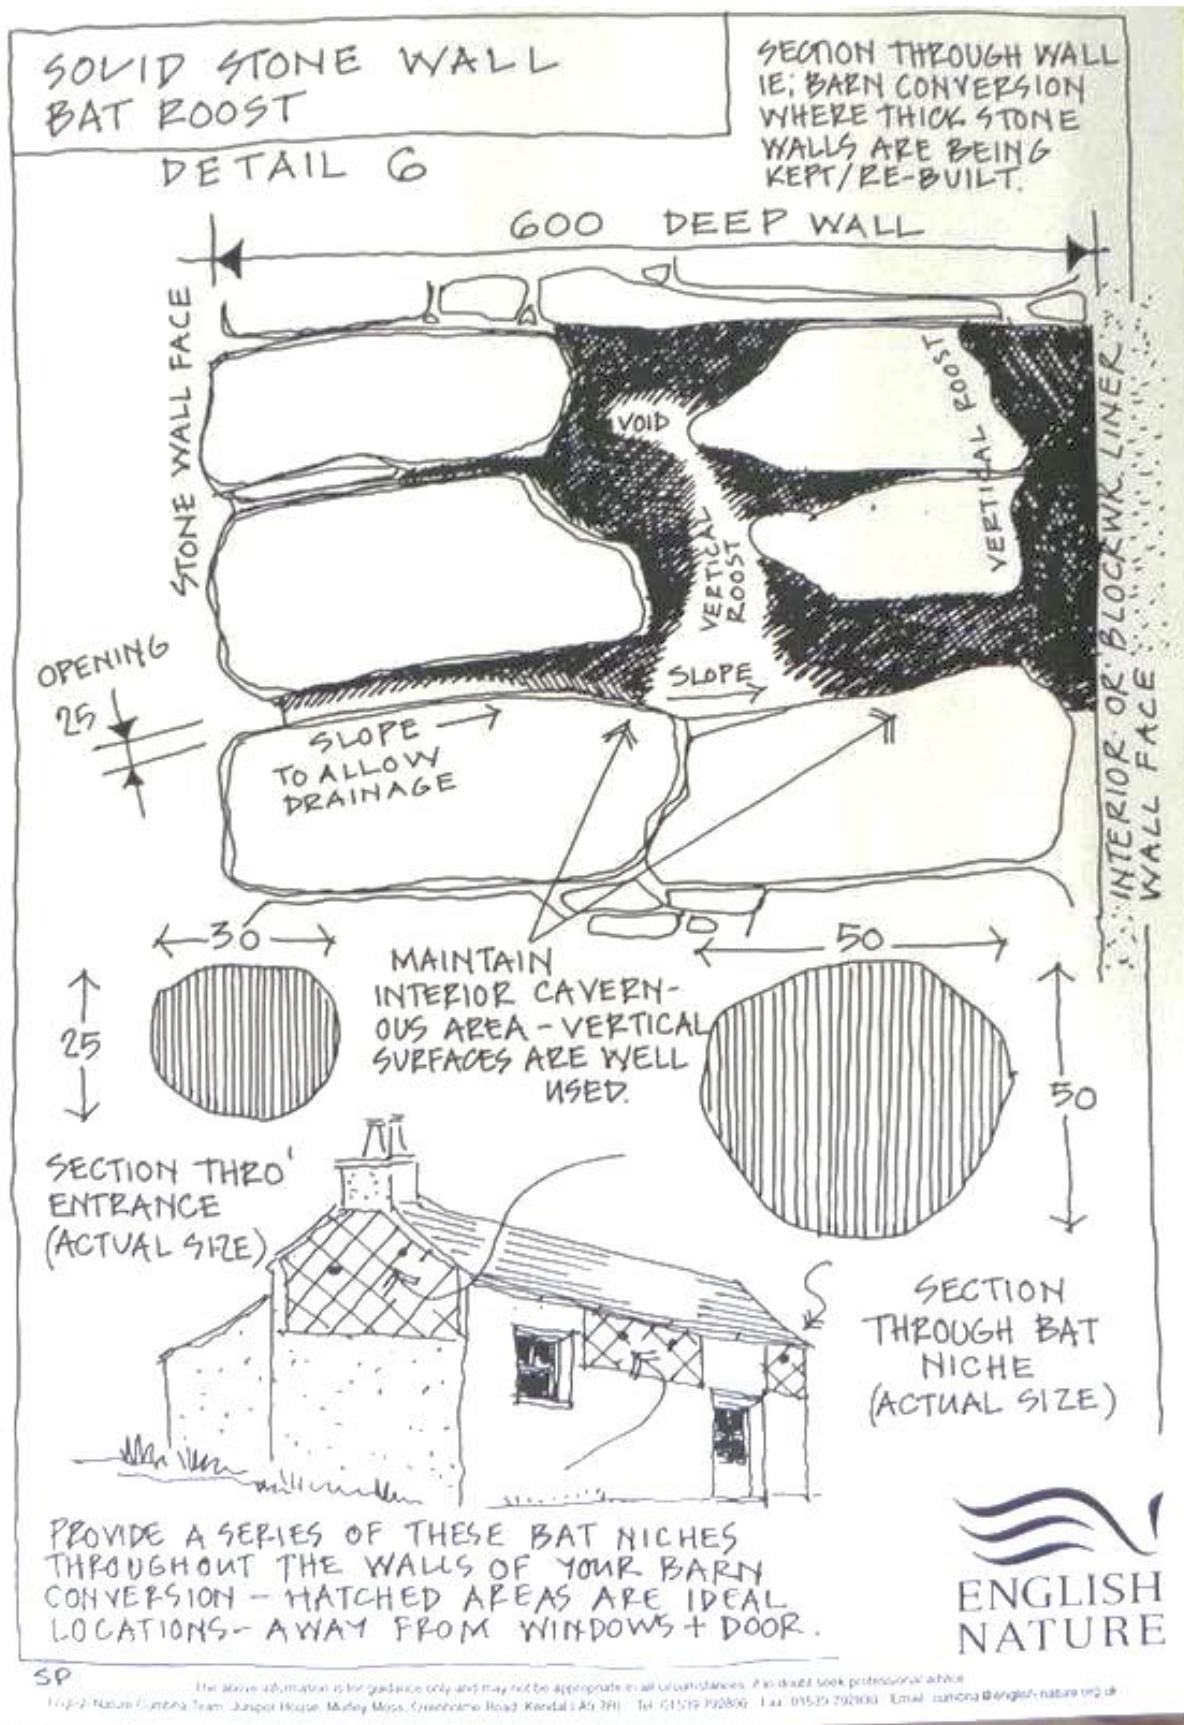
Figure E: Solid Stone Wall Bat Roost (Source: English Nature).
